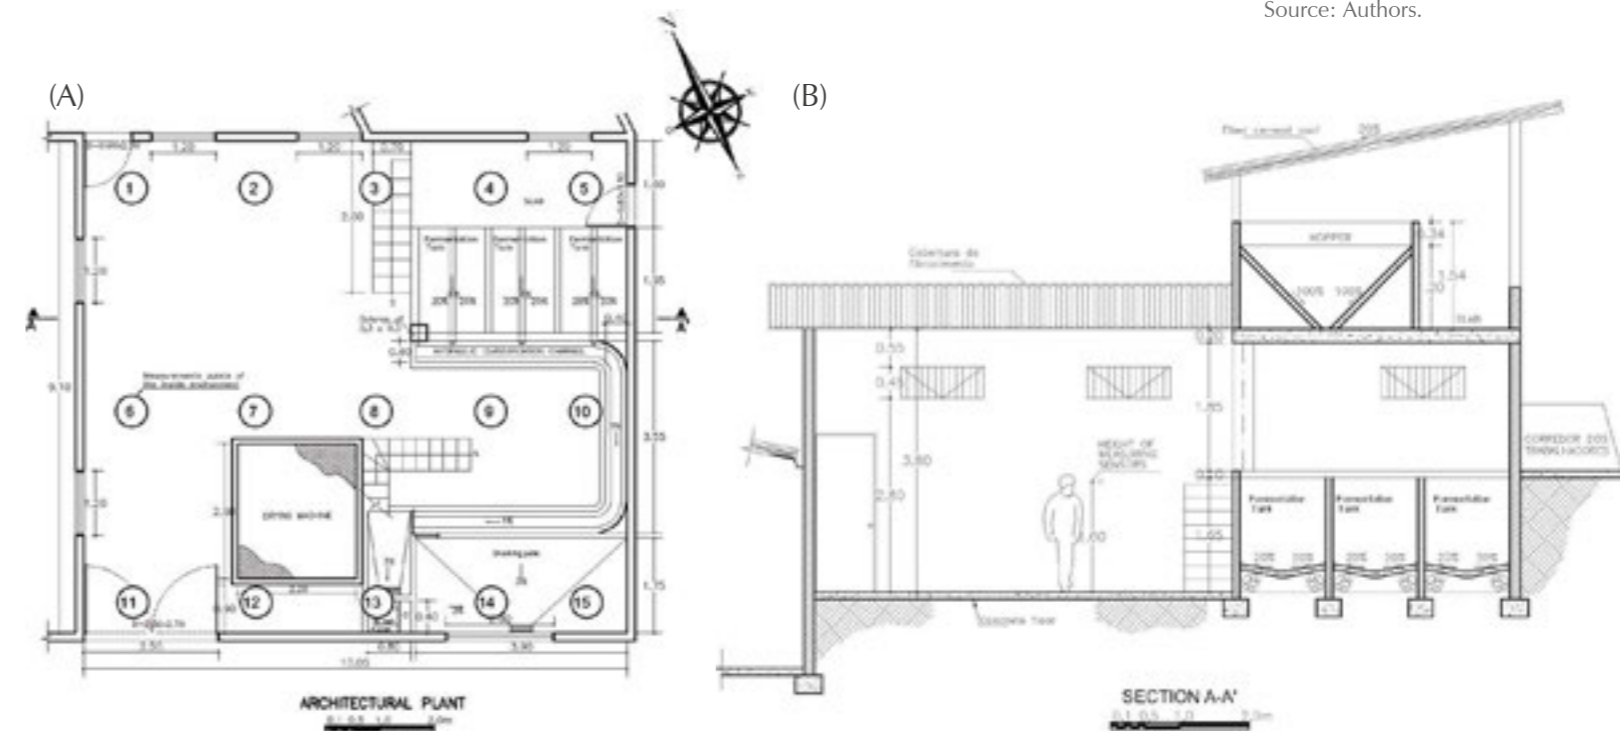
Building 2. (A) Distribution of measurement points (in circles) in the architectural plan; and (B) Cross-section plan
